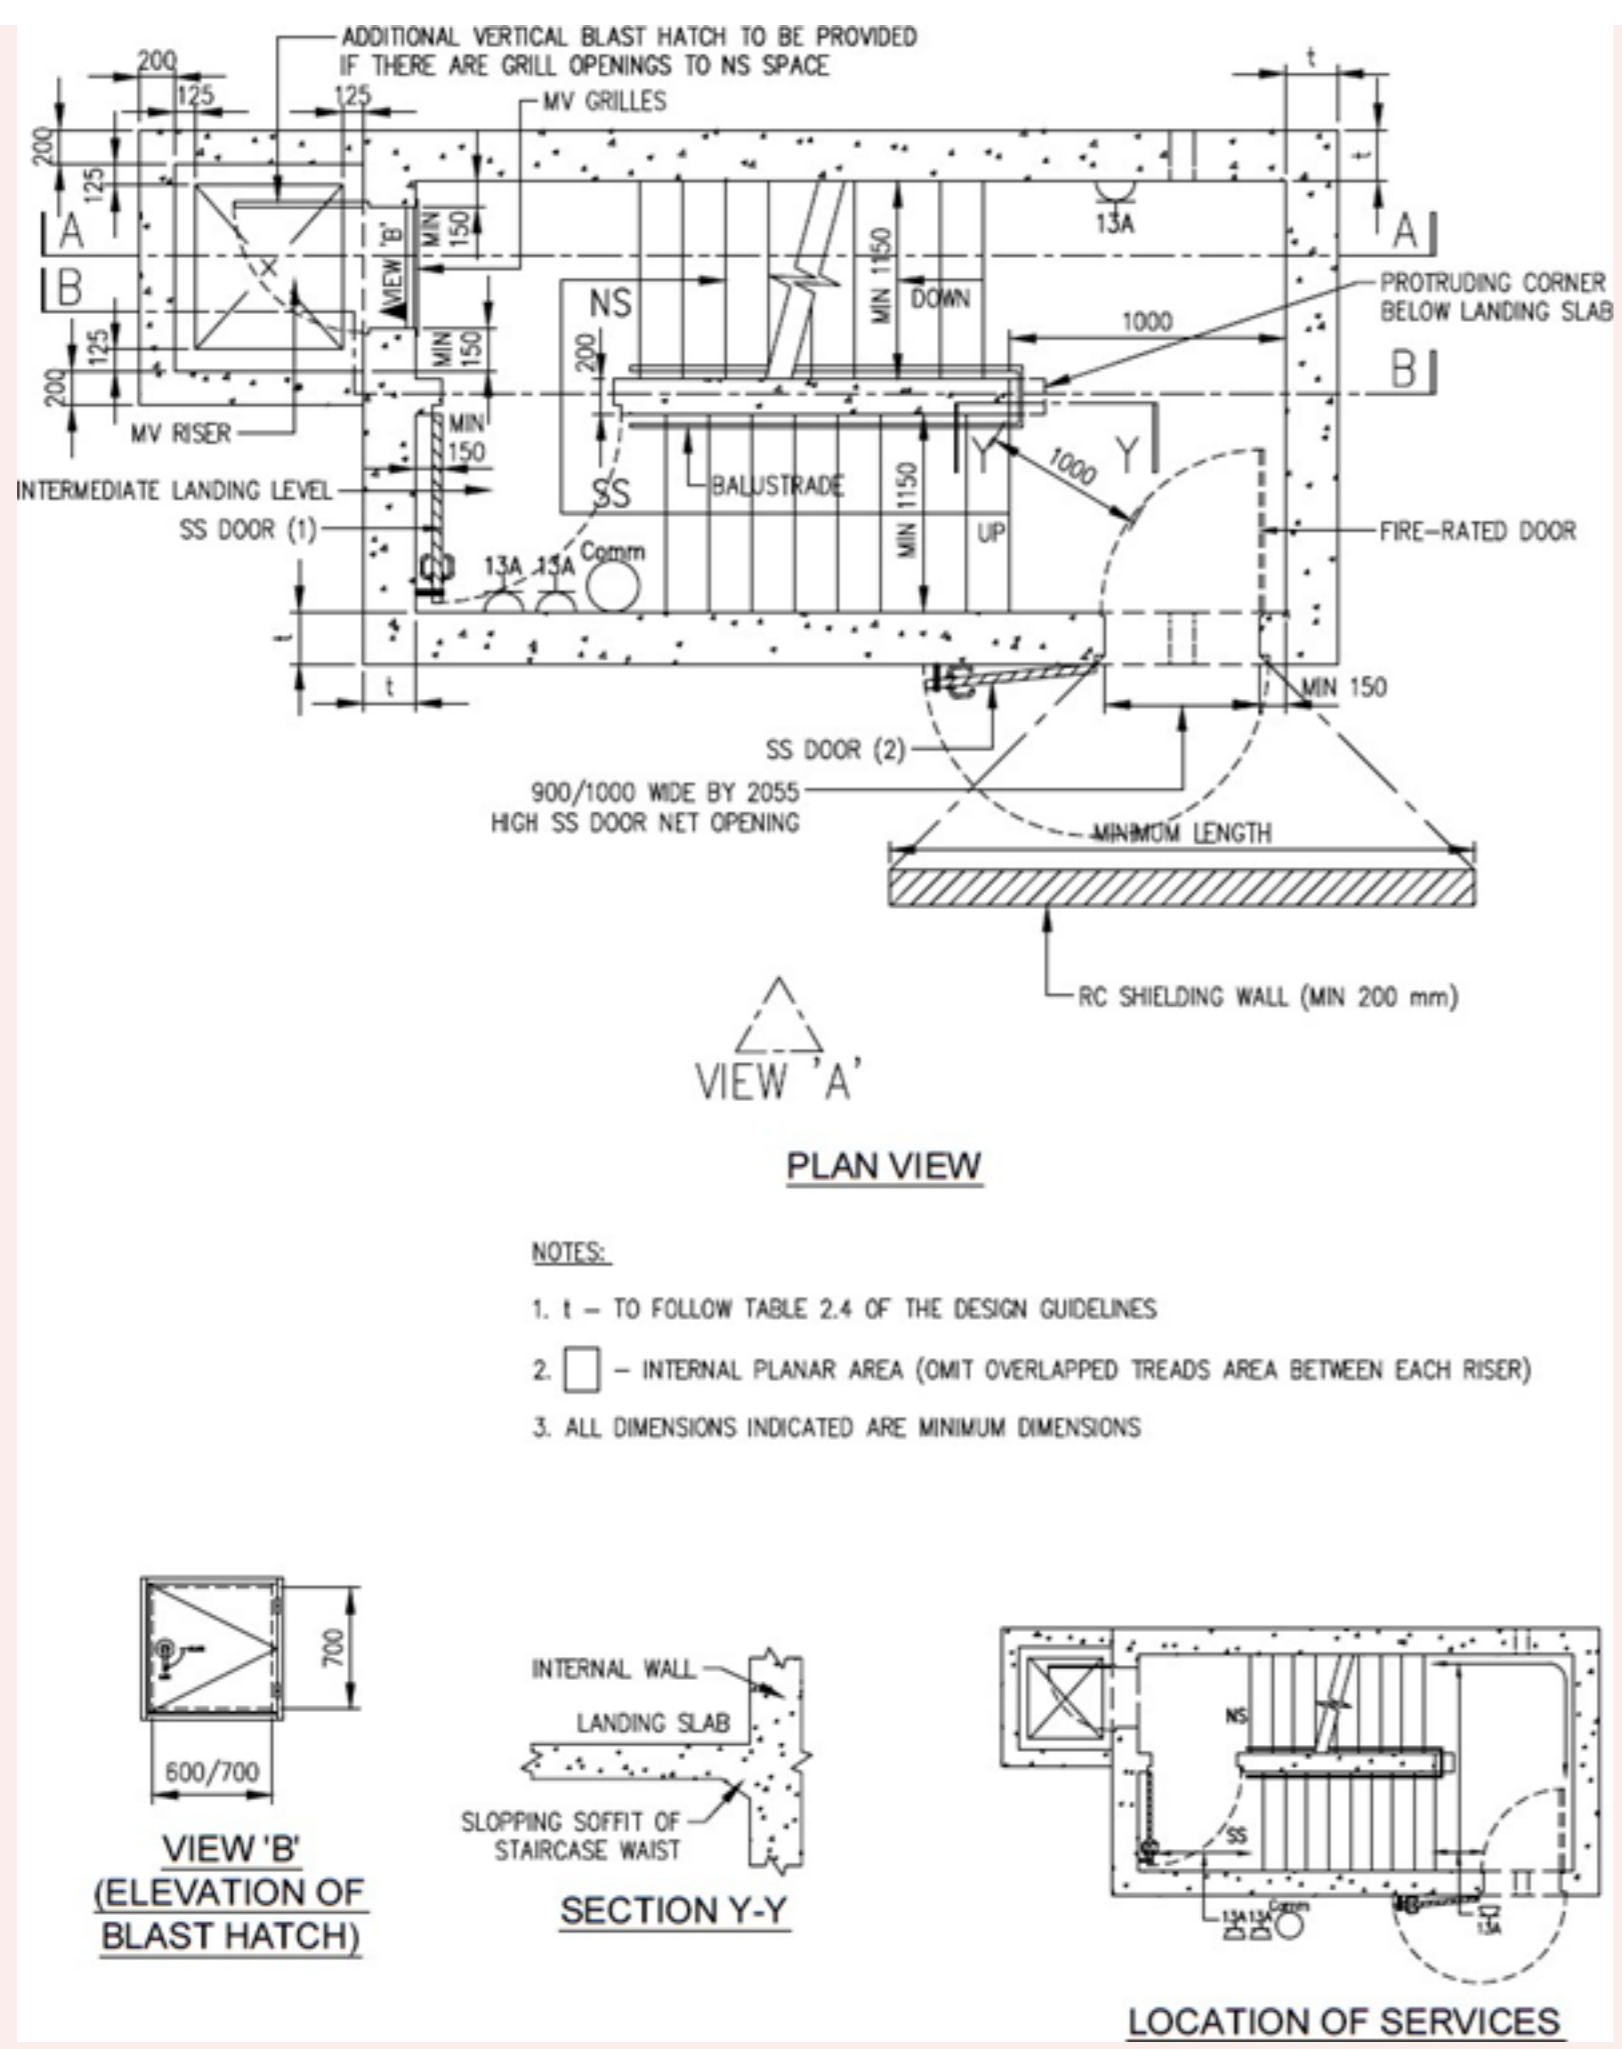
(f): TYPICAL PLAN OF S/C SS COMPARTMENT
